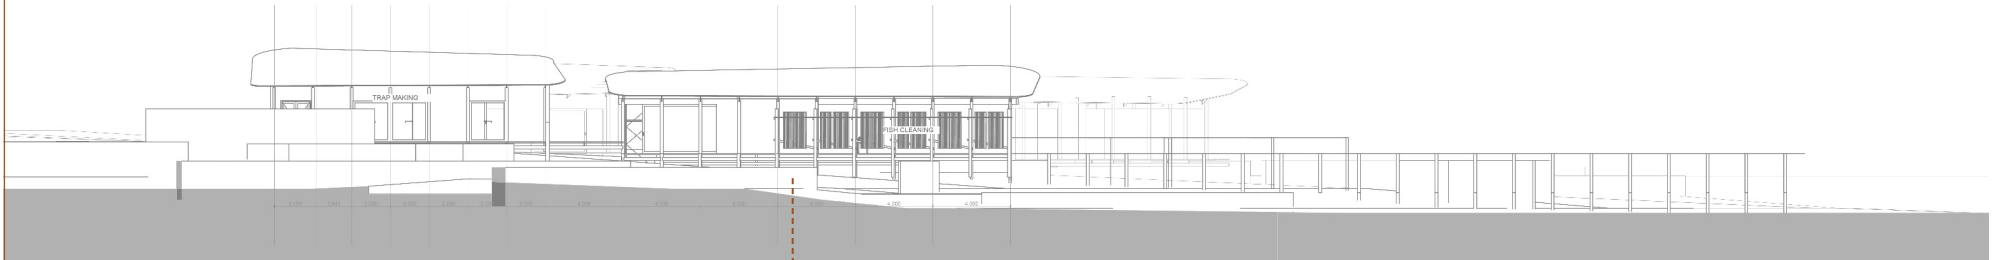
SECTION - COMMUNITY PAVILION SOUTH ELEVATION (AUTHOR,2023)
